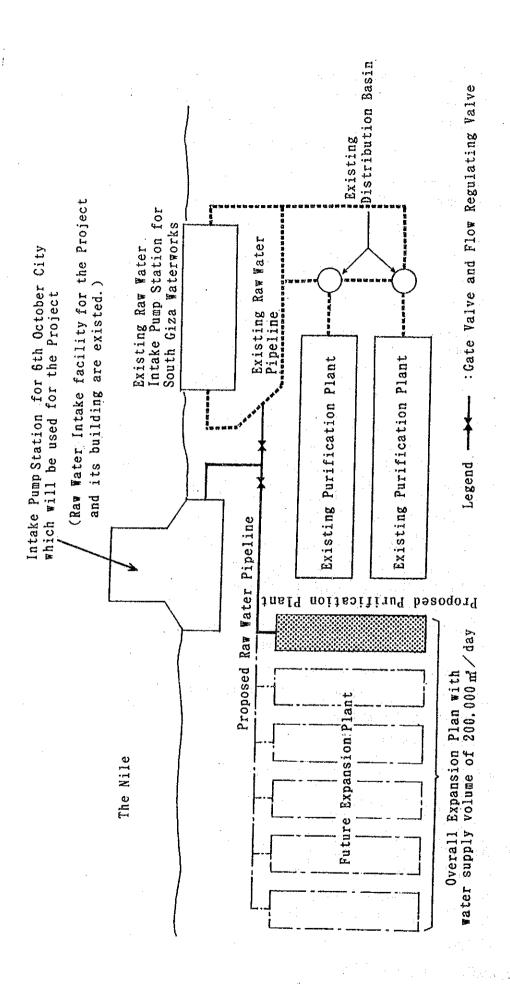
Conceptual Drawing of Intake System for Expansion Plan
